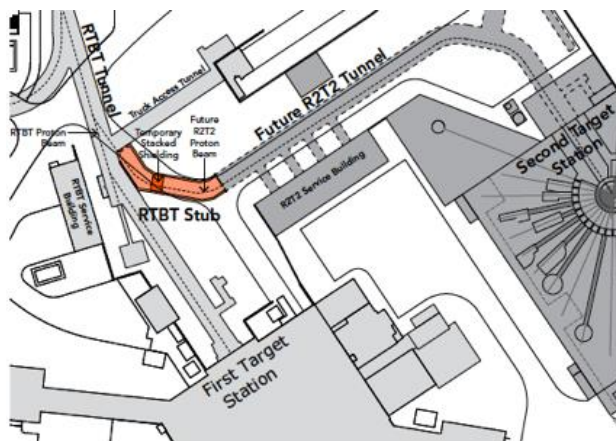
Layout of the RTBT tunnel stub (red) for connection to the STS.
